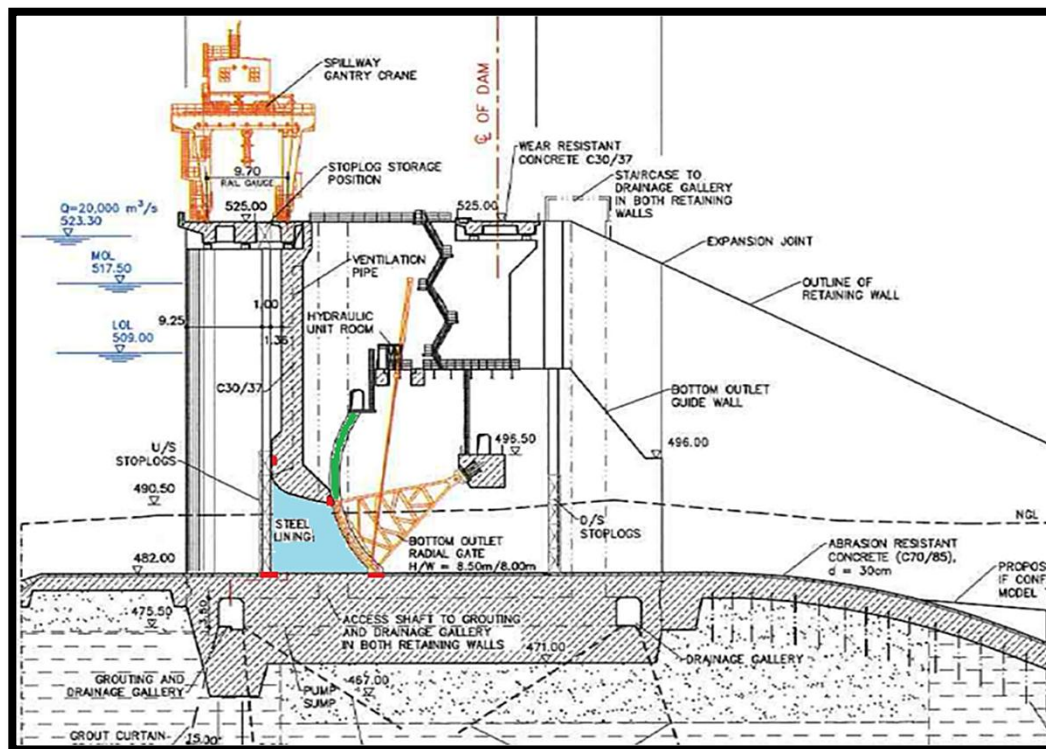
Example Cross Section of Hydro mechanical Equipment's in upper Atbara Spillway
